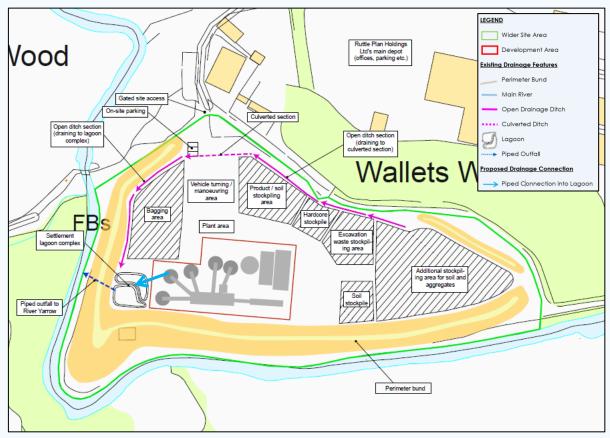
Preliminary Drainage Strategy Plan (The Mineral Planning Group Ltd., 2020)
